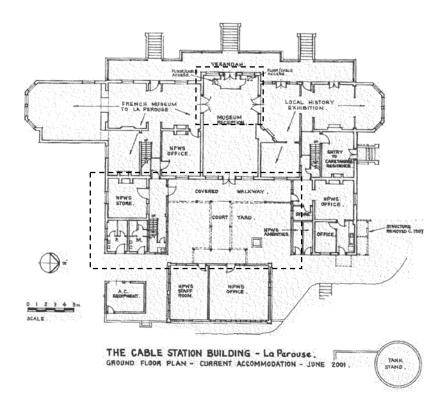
Ground floor plan of Cable Station building in 2001 (from Danis et al.: 167).
